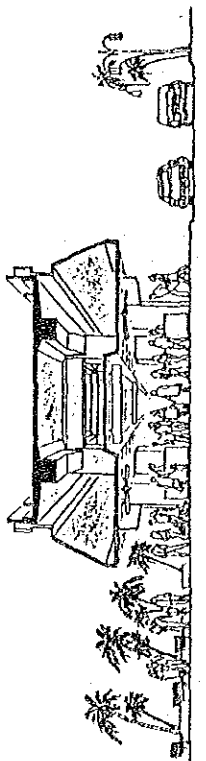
Concept of Side Road and Utilization Planning Under Elevated Tracks
